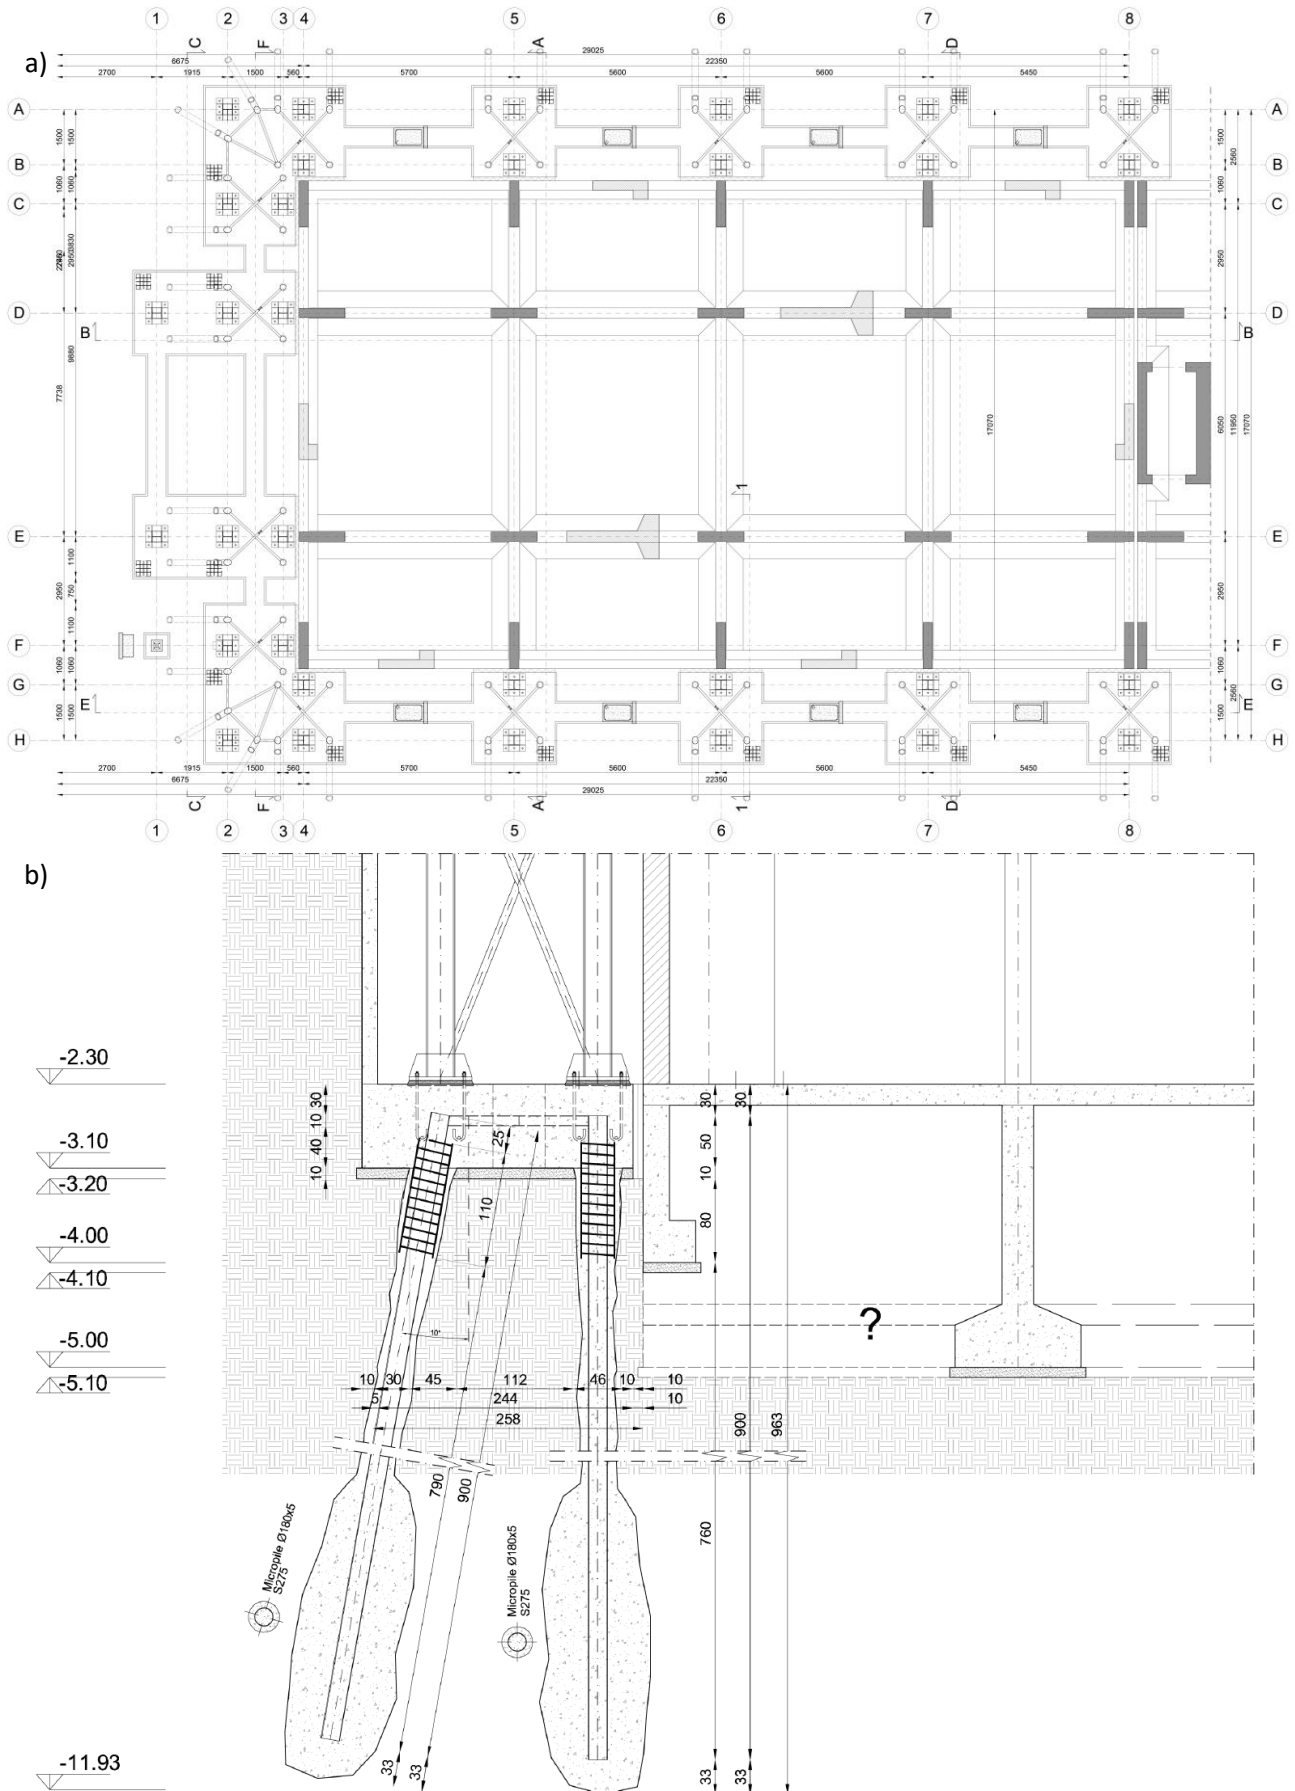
a) Planimetric distribution of the foundations around the existing RC structure indicating cross-sections and positions of the micro-piles; b) vertical cross-section detail of the foundation system proposed for the Athens case study; the question mark on the existing foundations underline the uncertainties related with their distribution
